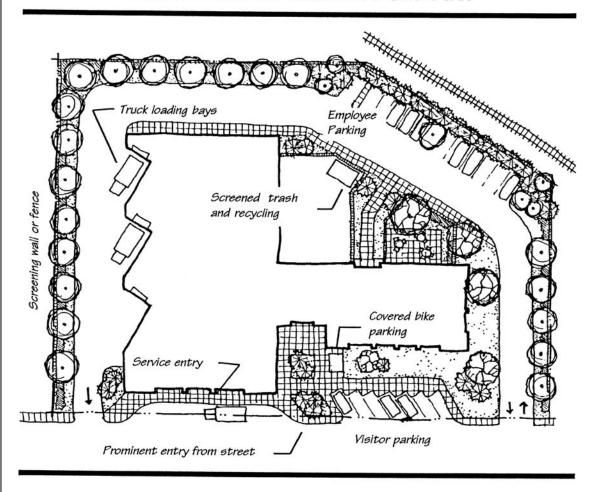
B Basic Site Review Conceptual Site Plan
